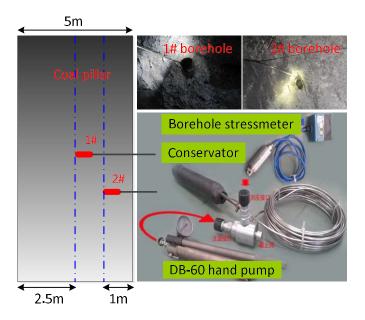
The layout and system connection of the borehole stress meter in coal pillar
